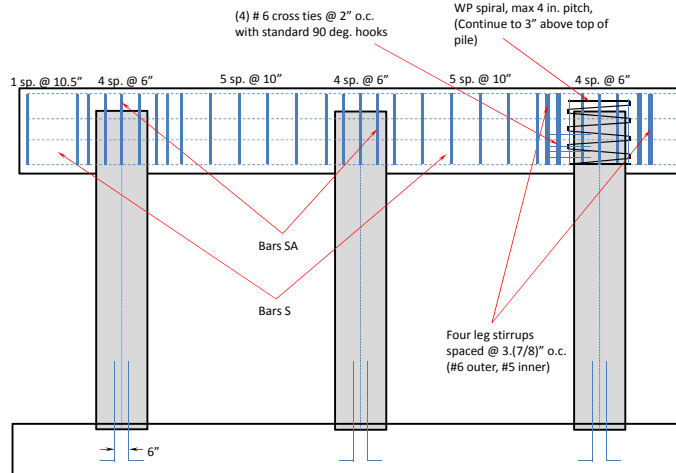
Bent Cap Shear Reinforcement - Three Pile Specimen
